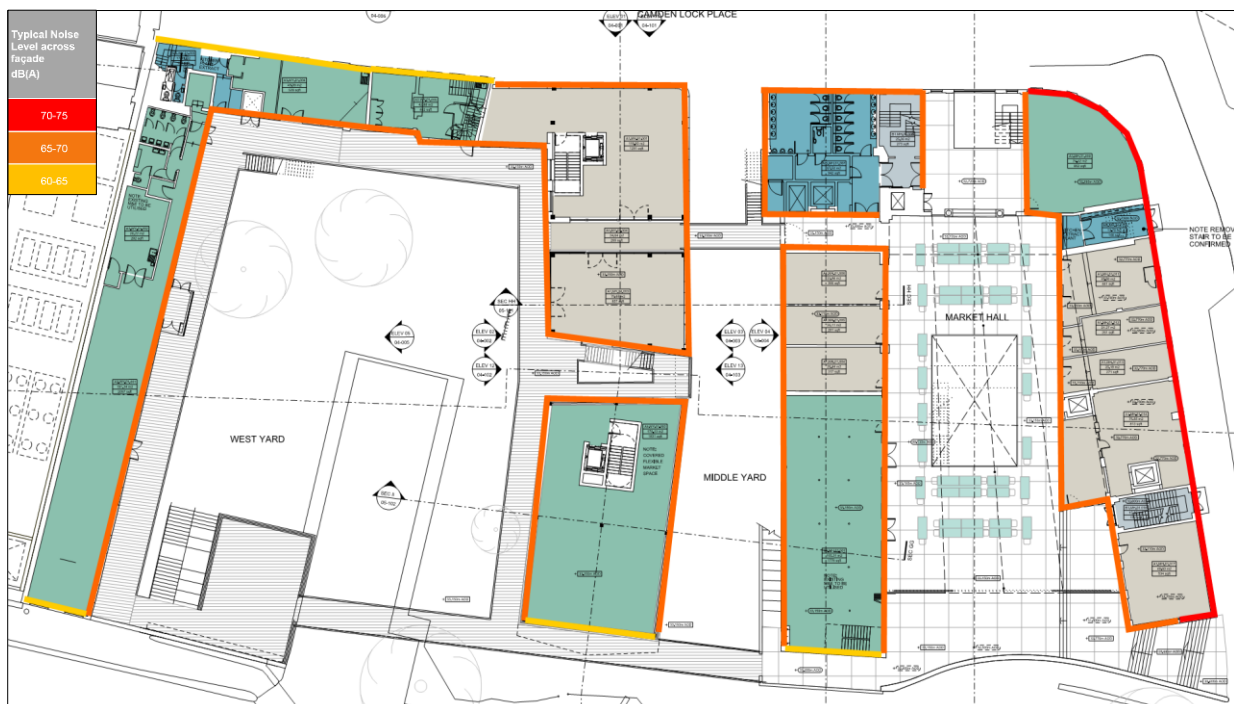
Typical Noise Level across façade - Upper Ground Floor
